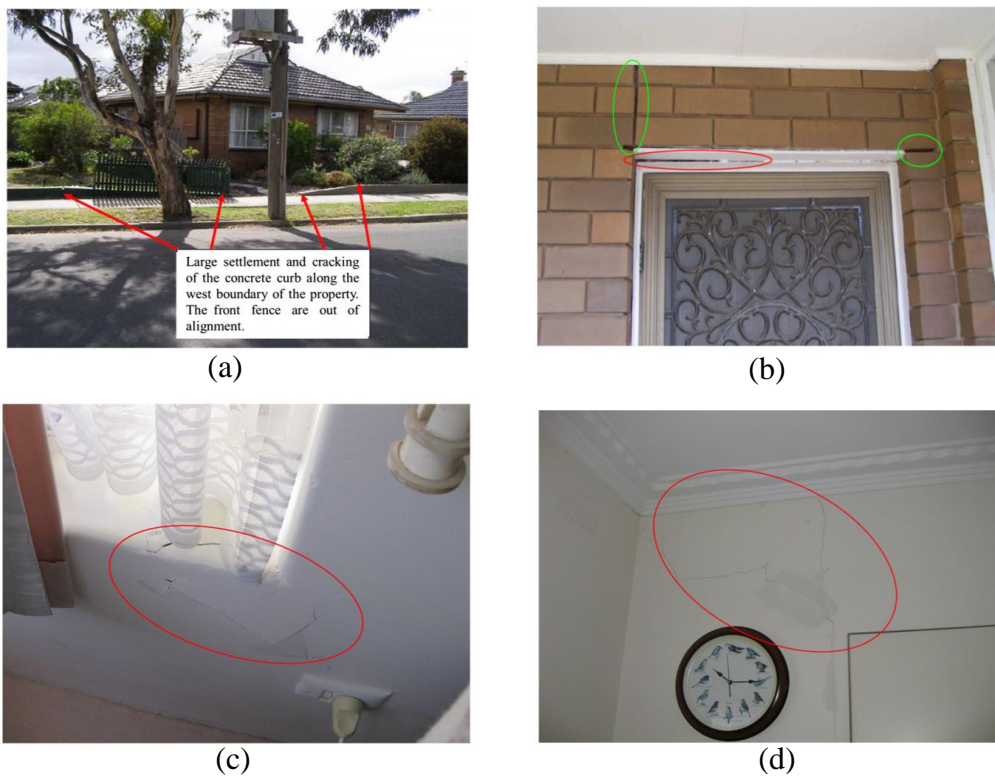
(a) Large settlement and cracking of the concrete curb (b) Distortion above the front entry door (c) Crack on the interior wall above the doorway to the kitchen (d) Cracking below a window of a bedroom of a residential building in a southwest suburb of Melbourne, Australia (Li & Guo, 2017).
